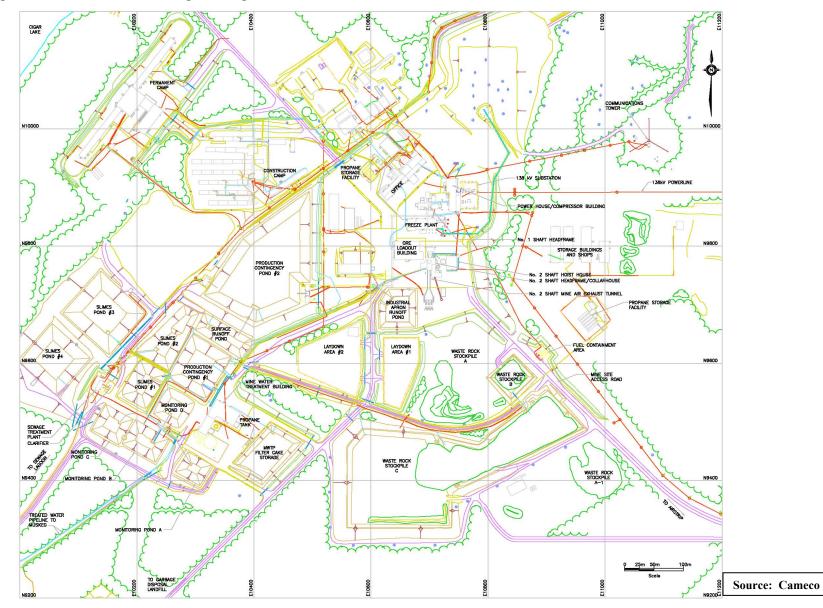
Site Plan Showing Existing and Planned Surface Facilities
